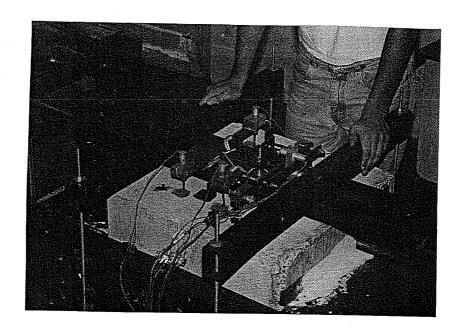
Close up view of specimen ready for testing with instrumentation in place
